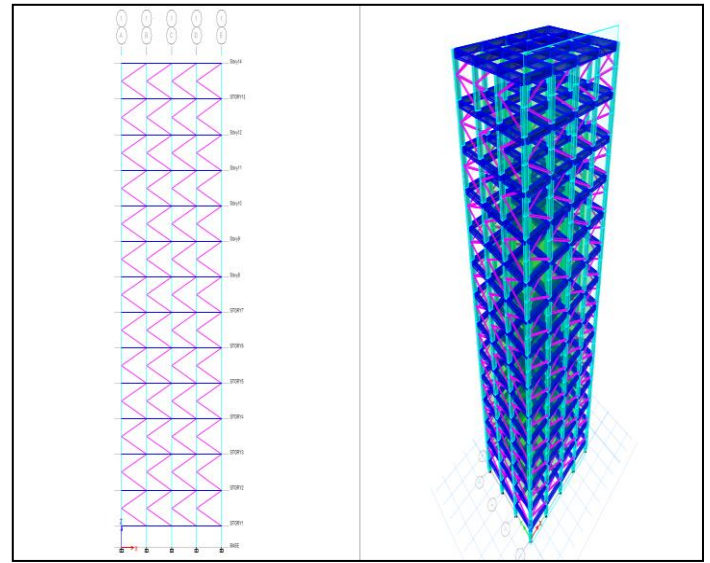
Elevation and 3D view of RC frame structure with K type bracing
